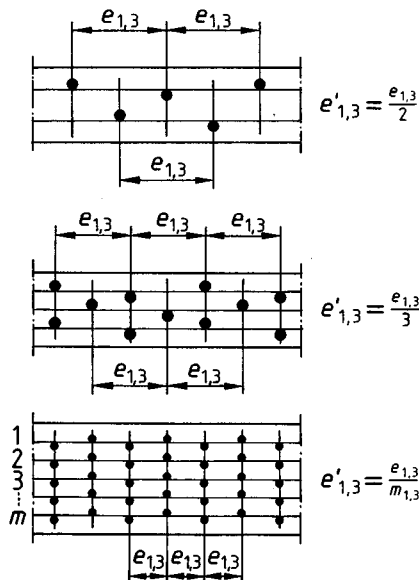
Spacing $e'_{1,3}$ of fasteners arranged in more than one row
